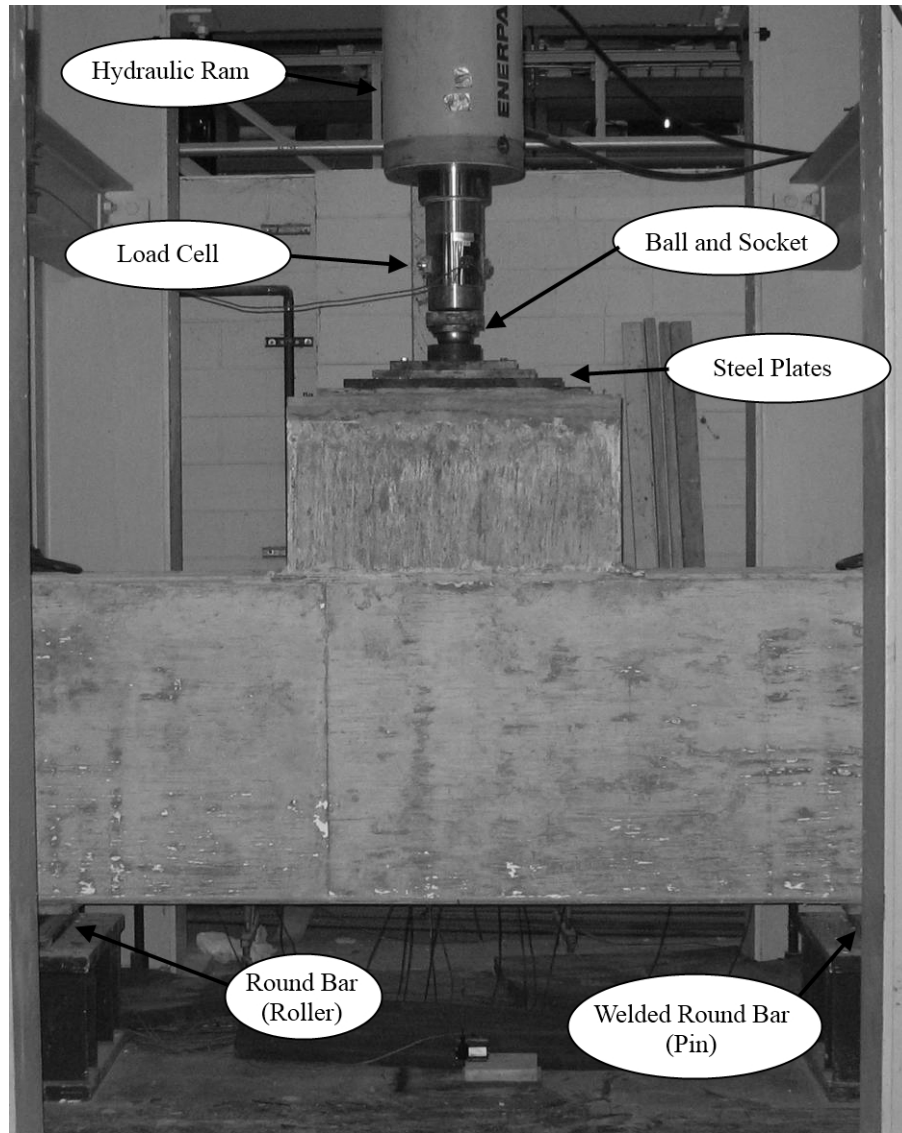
shows a large specimen in the load frame. For the large specimens a tapered stack of steel plates was used to distribute the force from the ball and socket joint into the column stub. The same pin and roller supports were used, and they were spaced to give the large specimens a 96 inch span. Figure 4.12 shows a large specimen with external instrumentation.
